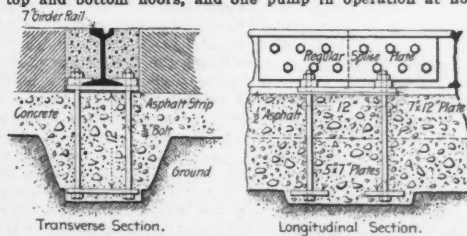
Details of Track Construction Used on West Main St., Showing Method of Anchoring Track.
